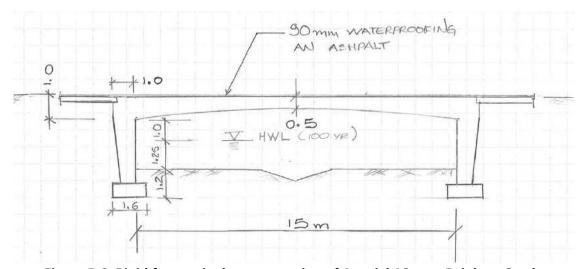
Rigid frame, single span crossing of Arterial A2 over Rainbow Creek
